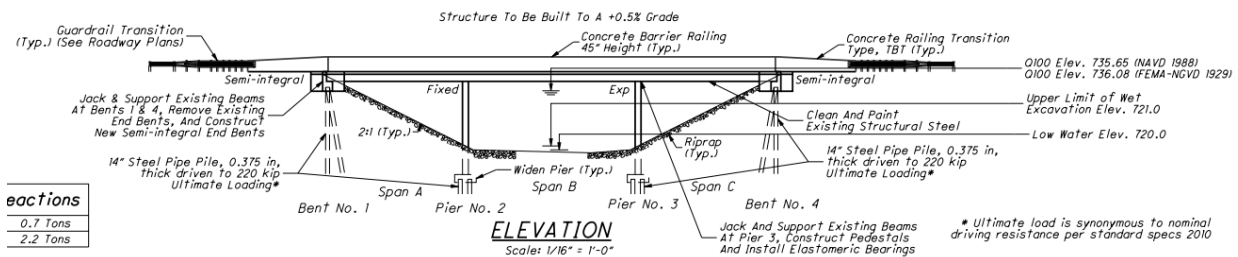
Elevation View of the Bridge (NBI 50340) (2009)
